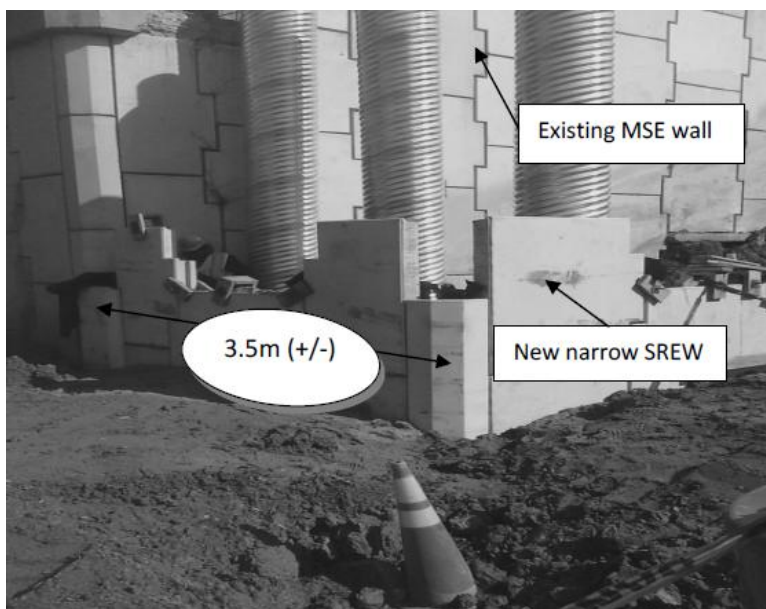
Construction of new section for Interstate 895 Connector, Virginia (Tavakolian and Grien, 2011)
